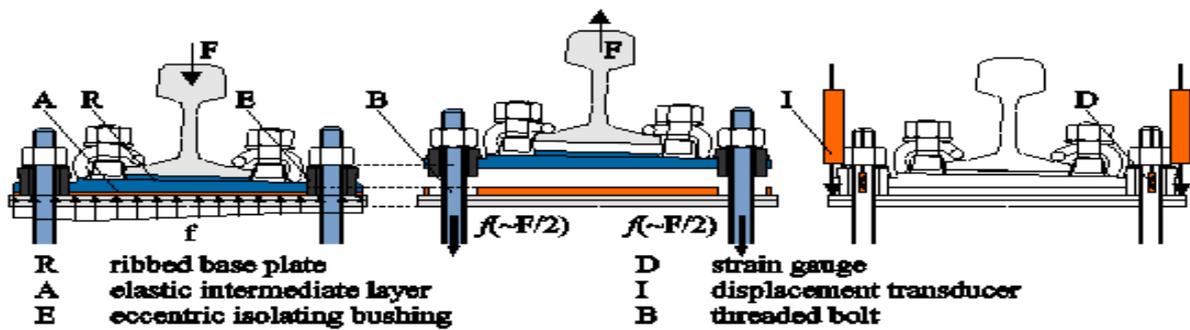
Load bearing mechanism of rail support point ECF (principle, superelevated illustration), measurement equipment at rail support point ECF (principle)
